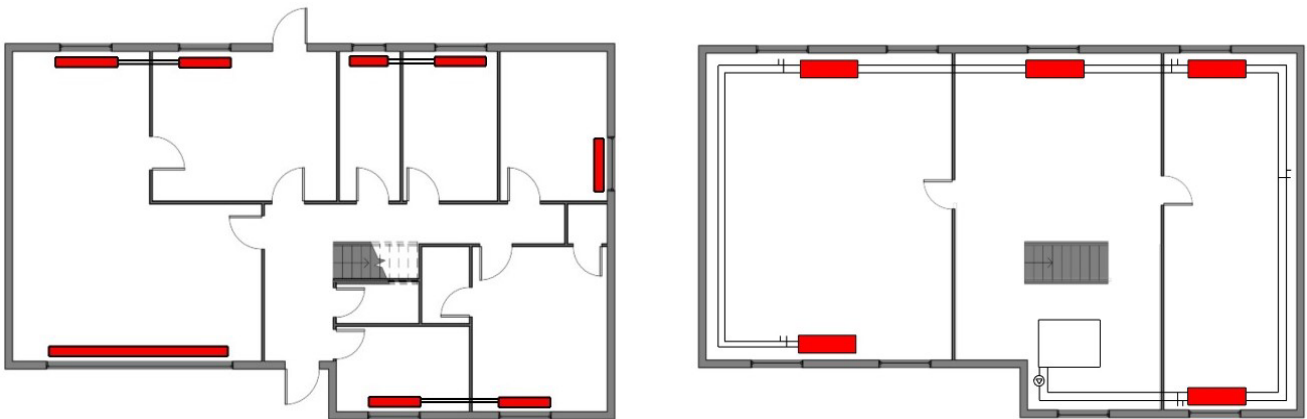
Layout of radiators and piping in Building 1, ground floor (left), basement (right). Rectangles marked in red are radiators, dual lines in between the radiators are the 2-way piping distribution.
